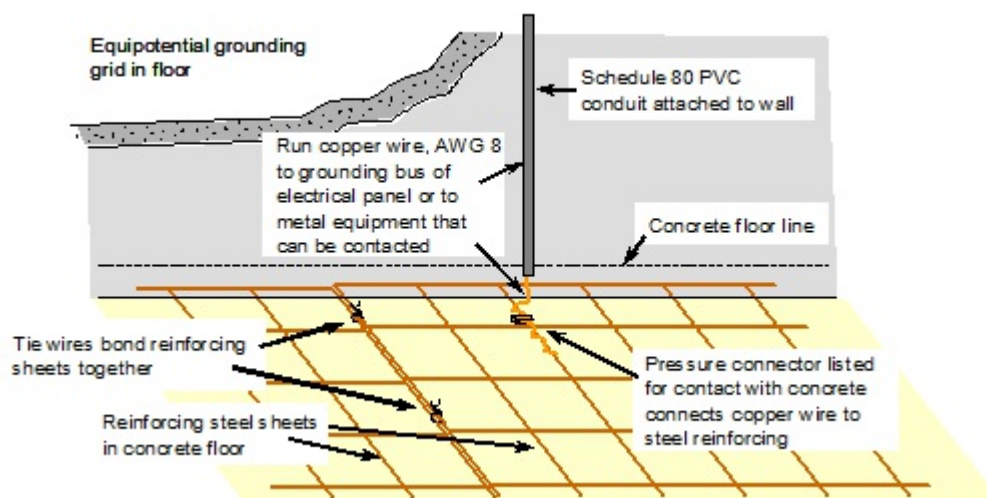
A typical means of establishing an equipotential grid is to insure that reinforcing bars or wire mats installed in concrete floors are connected together and a wire brought out of the concrete for connection to exposed metal equipment or to the grounding bus of the electrical supply panel.
